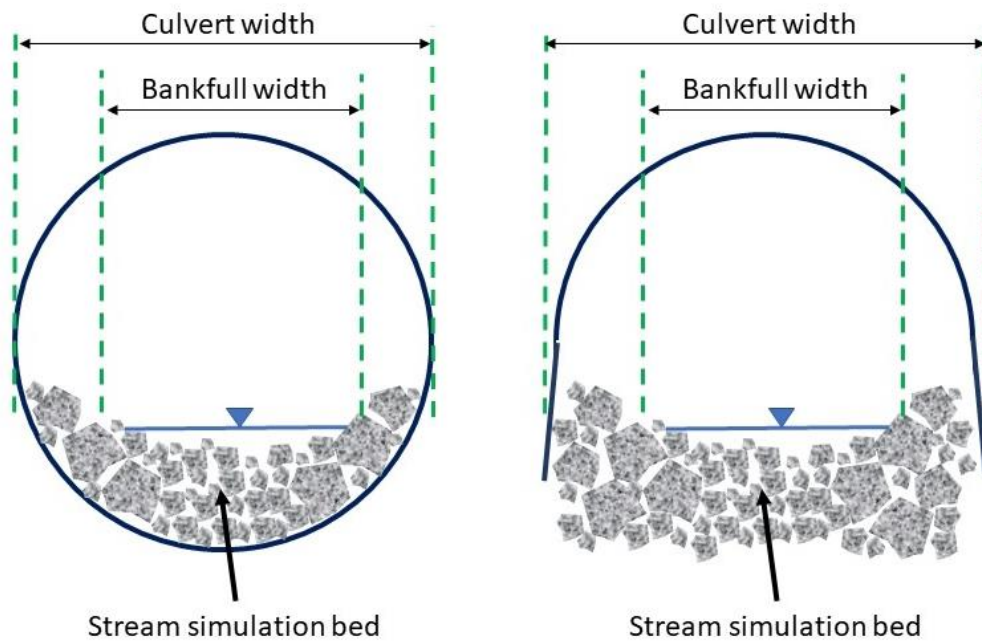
Illustration of indicative culvert sizing relative to bankfull width for a stream simulation design using an embedded round culvert or arch culvert.
